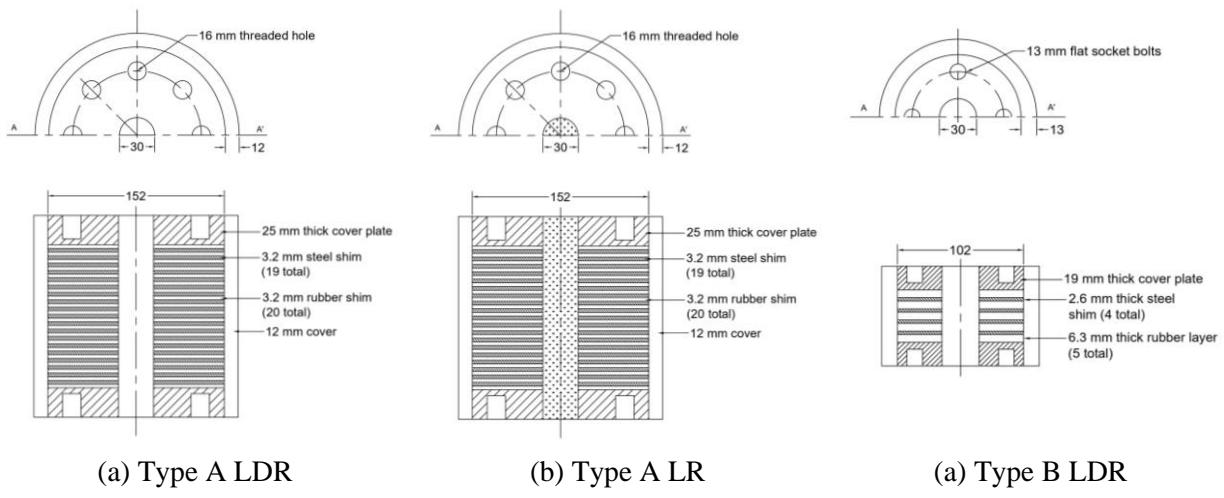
Construction drawings for the LDR and LR bearings (All dimensions are in mm)
